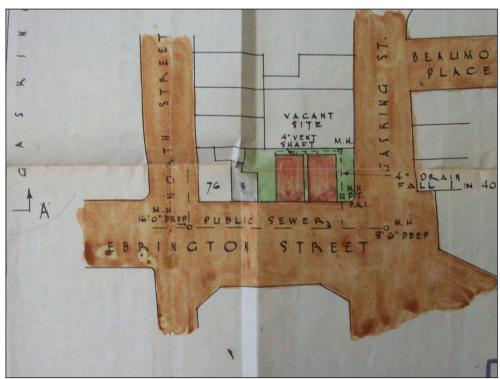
Architects plan (1947) showing the location of the proposed temporary 'Nissen' Hut shops.
